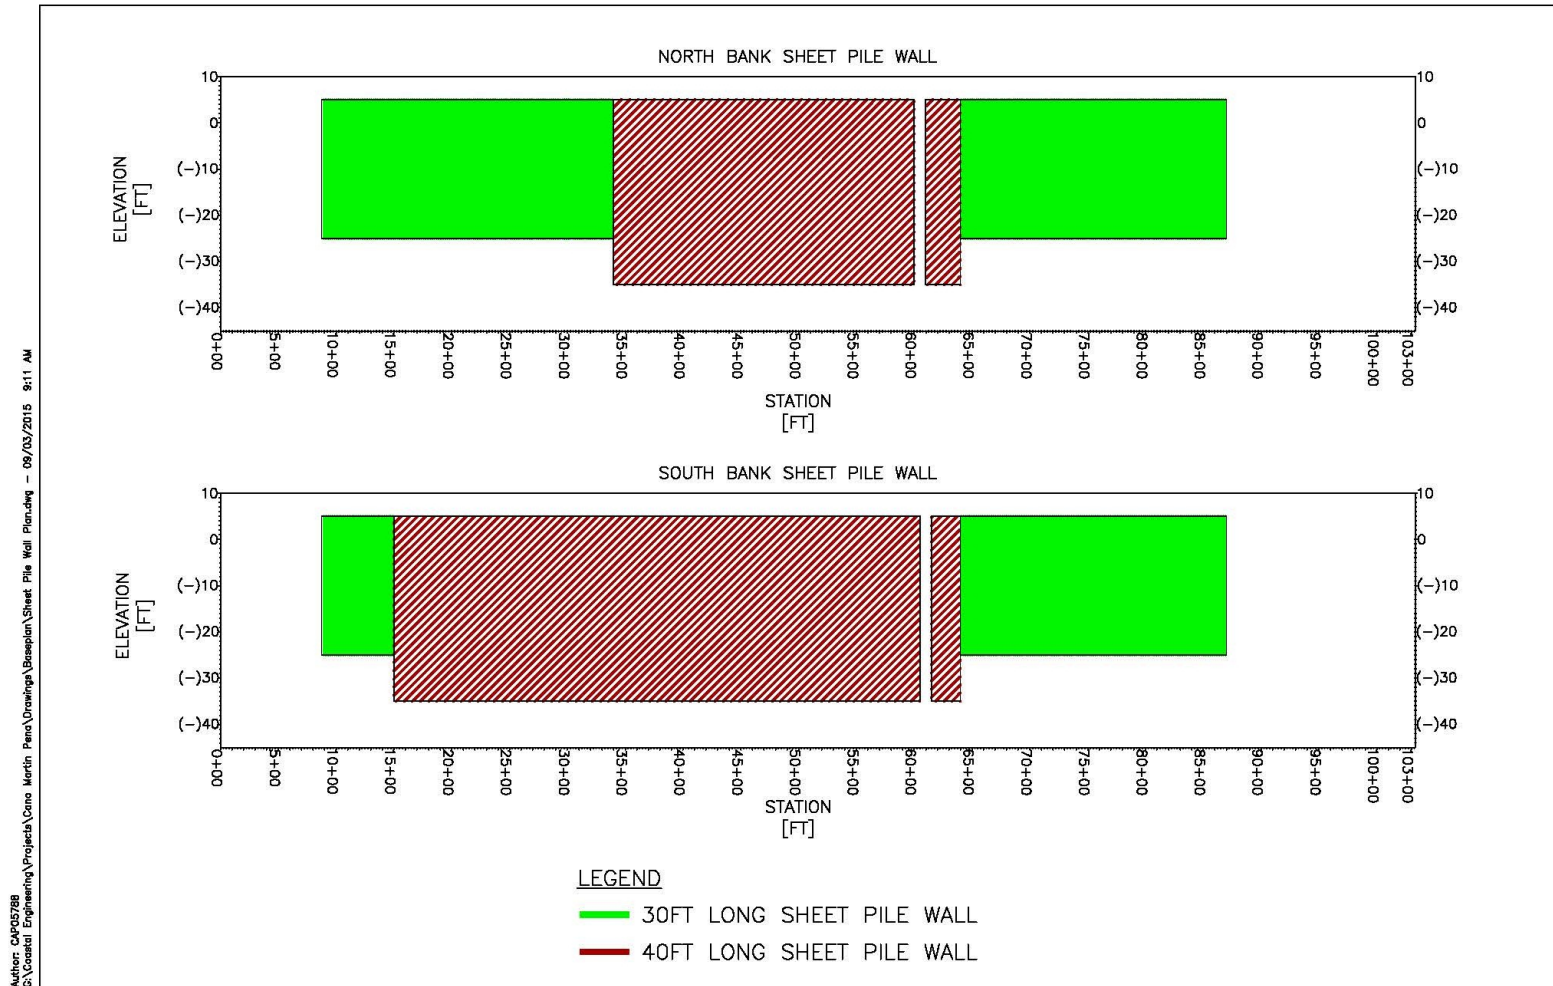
Sheet Pile Wall Elevation, 10-foot-deep Channel
